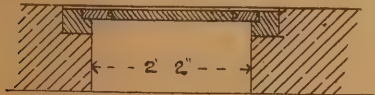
B. ELEVATION OF GAS BOX TOWARDS GAS CELL.
